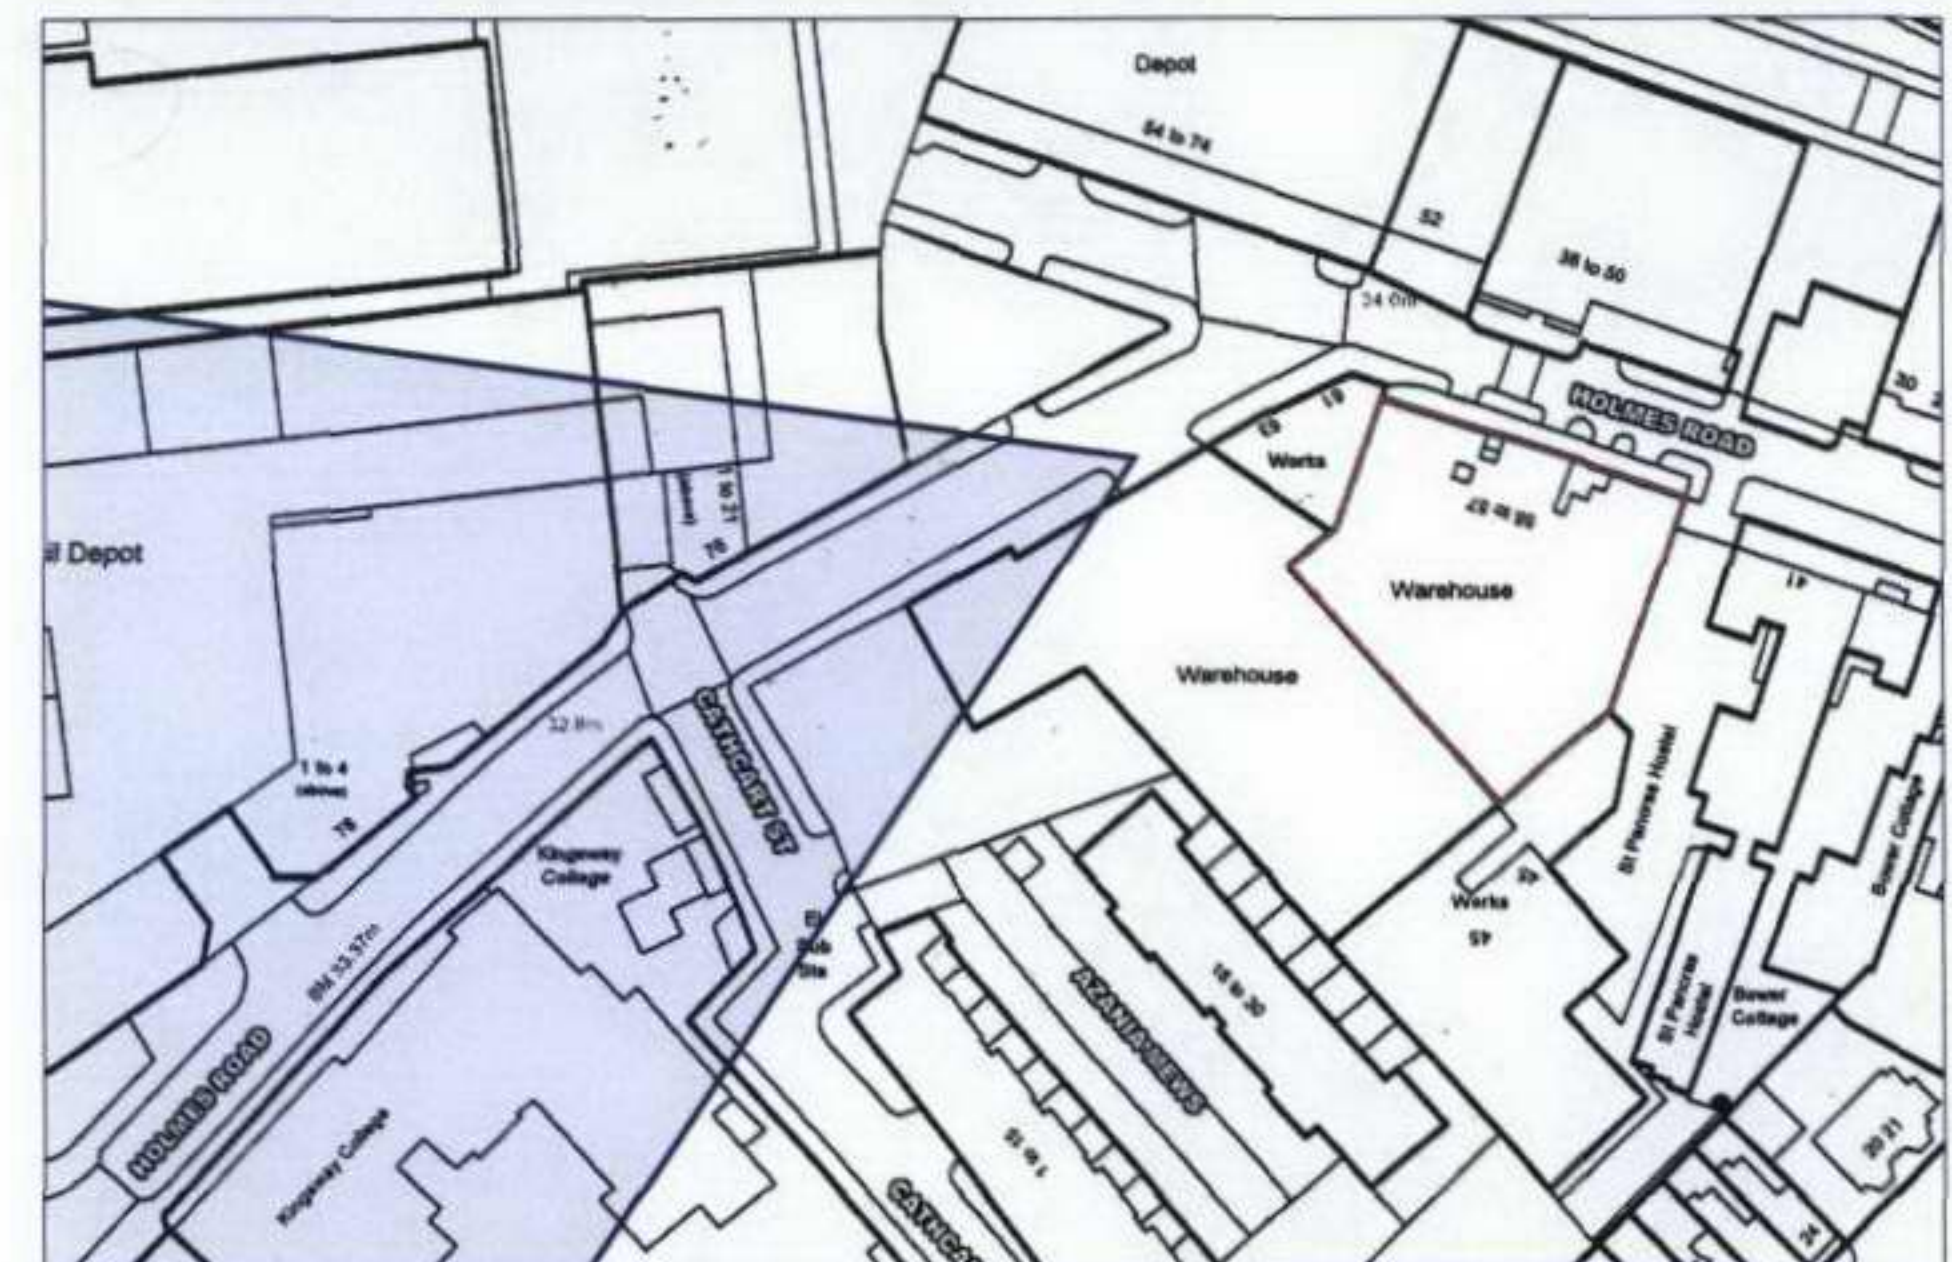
Site plan locating the photograph shown in fig.1 in relation to 55 Holmes Road.
